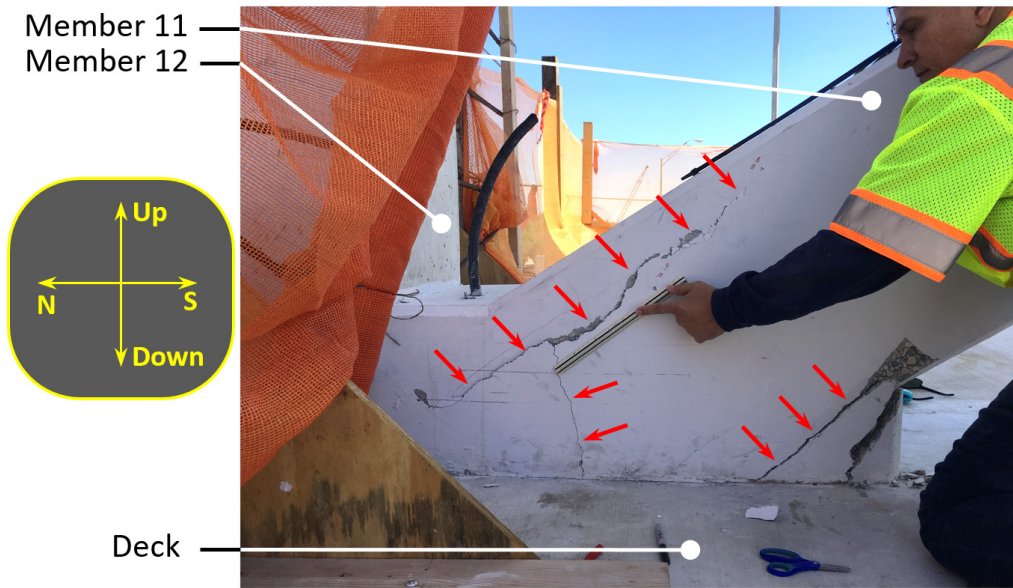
Photograph showing the west face of truss member 11 where it meets the deck on March 13, 2018 at 11:17 a.m. Corresponds to Bridge Factors Factual Report Photo 83.
